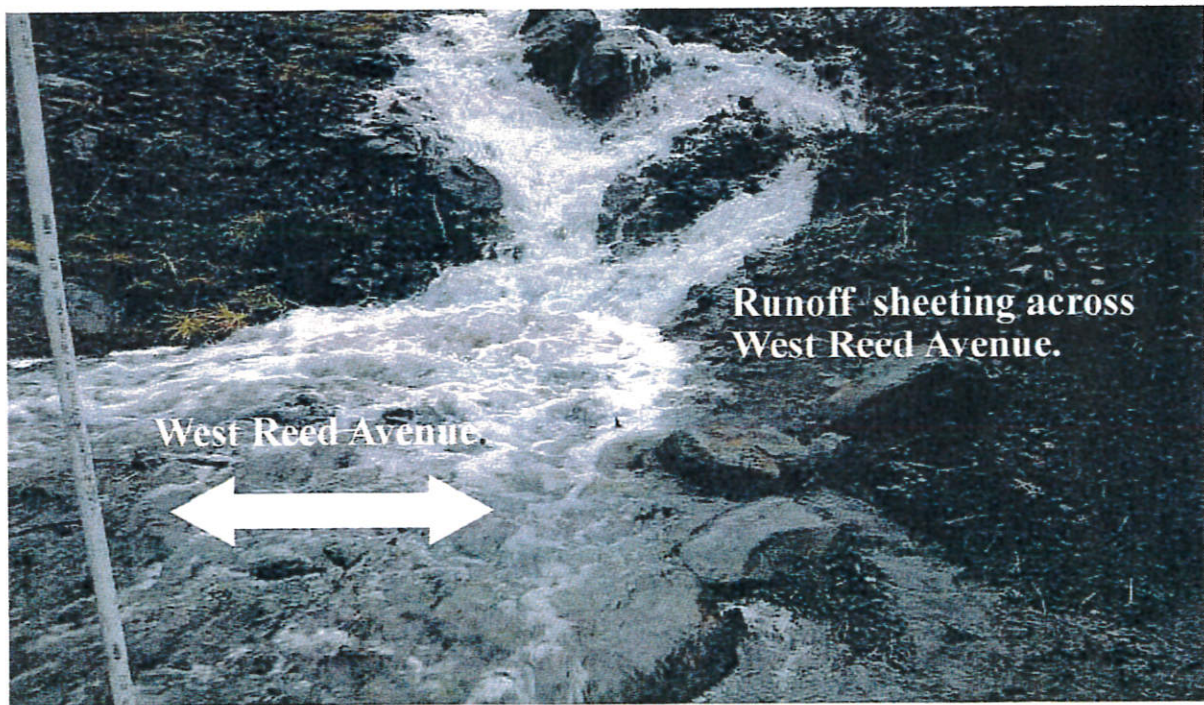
Looking downslope along the culvert where eroded material is being transported down the hillside above West Reed Avenue. Photo taken June 6, 2006.
